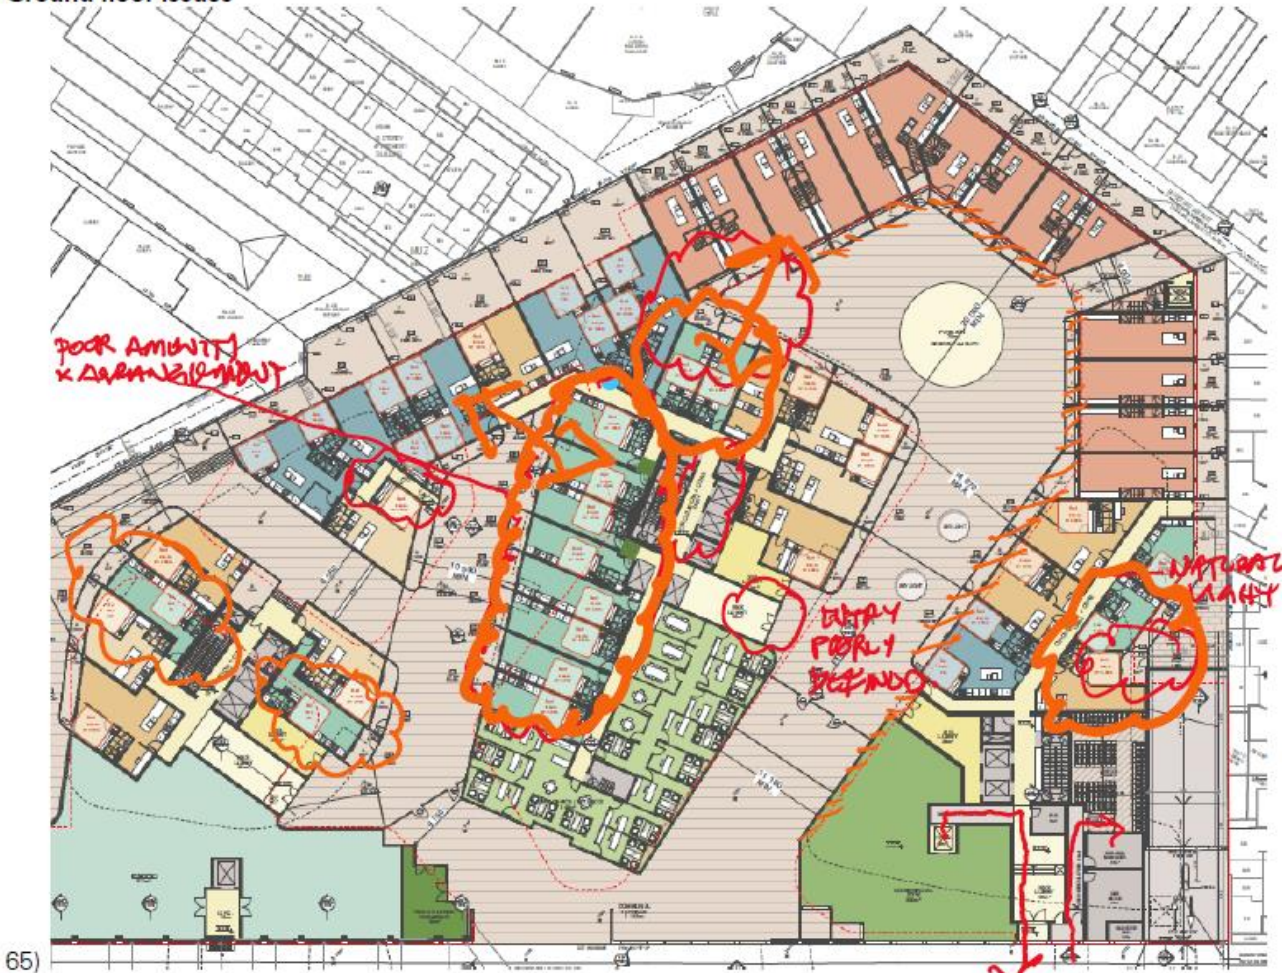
Plan annotated by Mr Rob McGauran – Ground floor Plan
